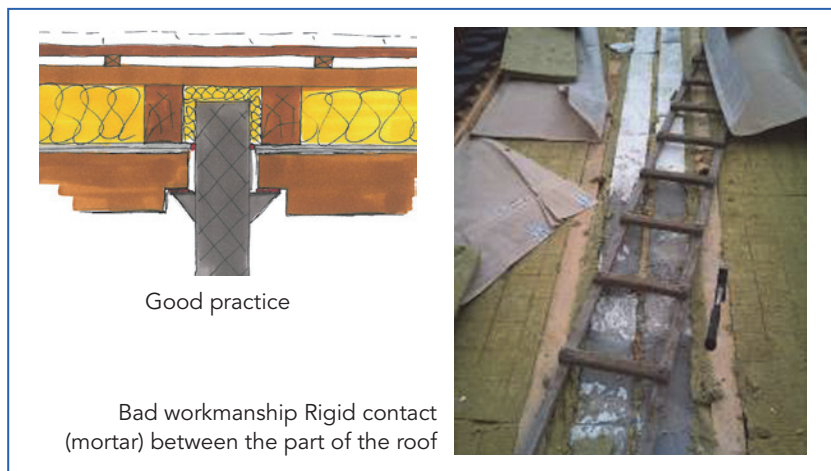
Good practice and bad workmanship for wall/roof junctions.
